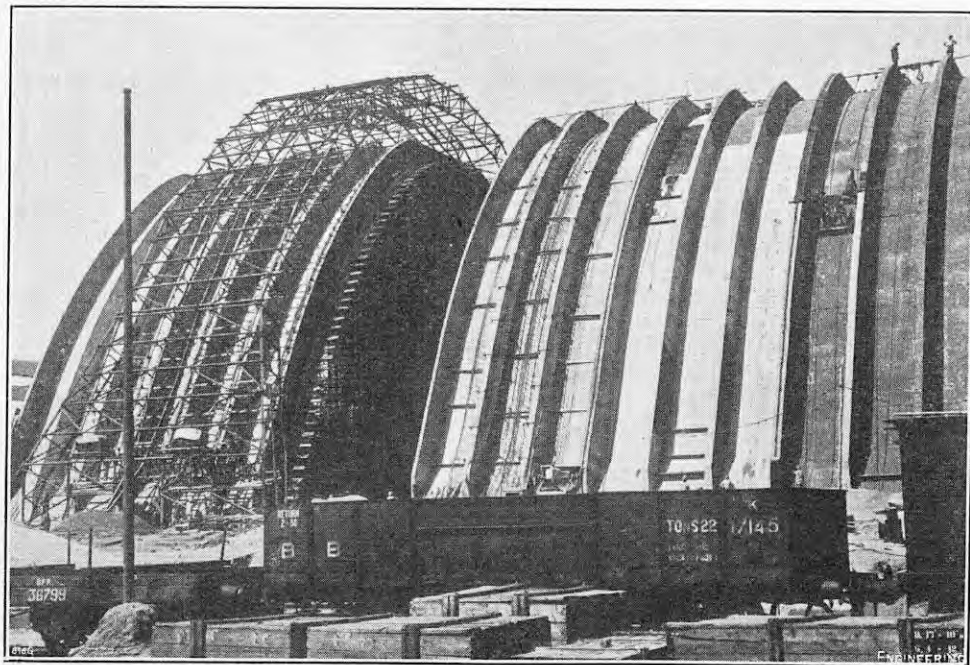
SILO ARCHES UNDER CONSTRUCTION.
